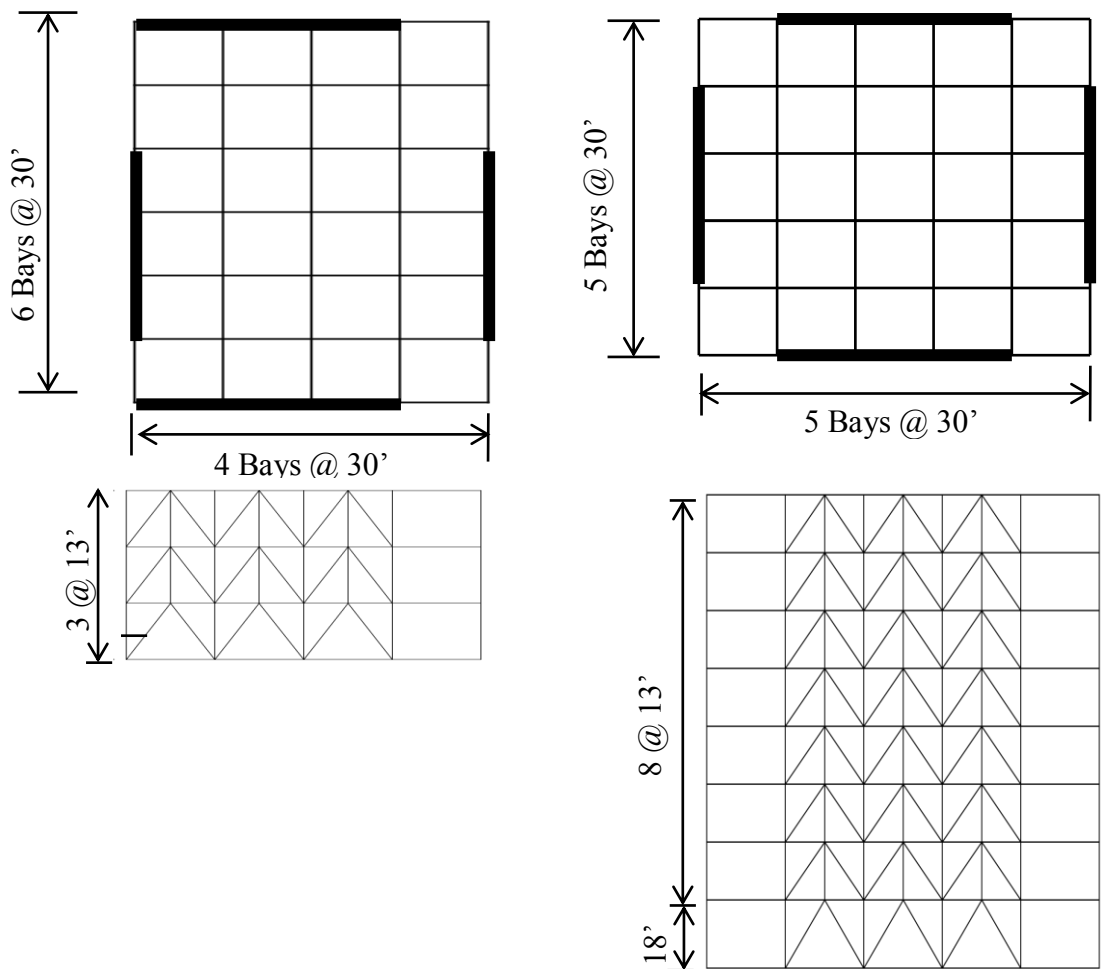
Floor Plan and Elevation of Model Buildings [1]
